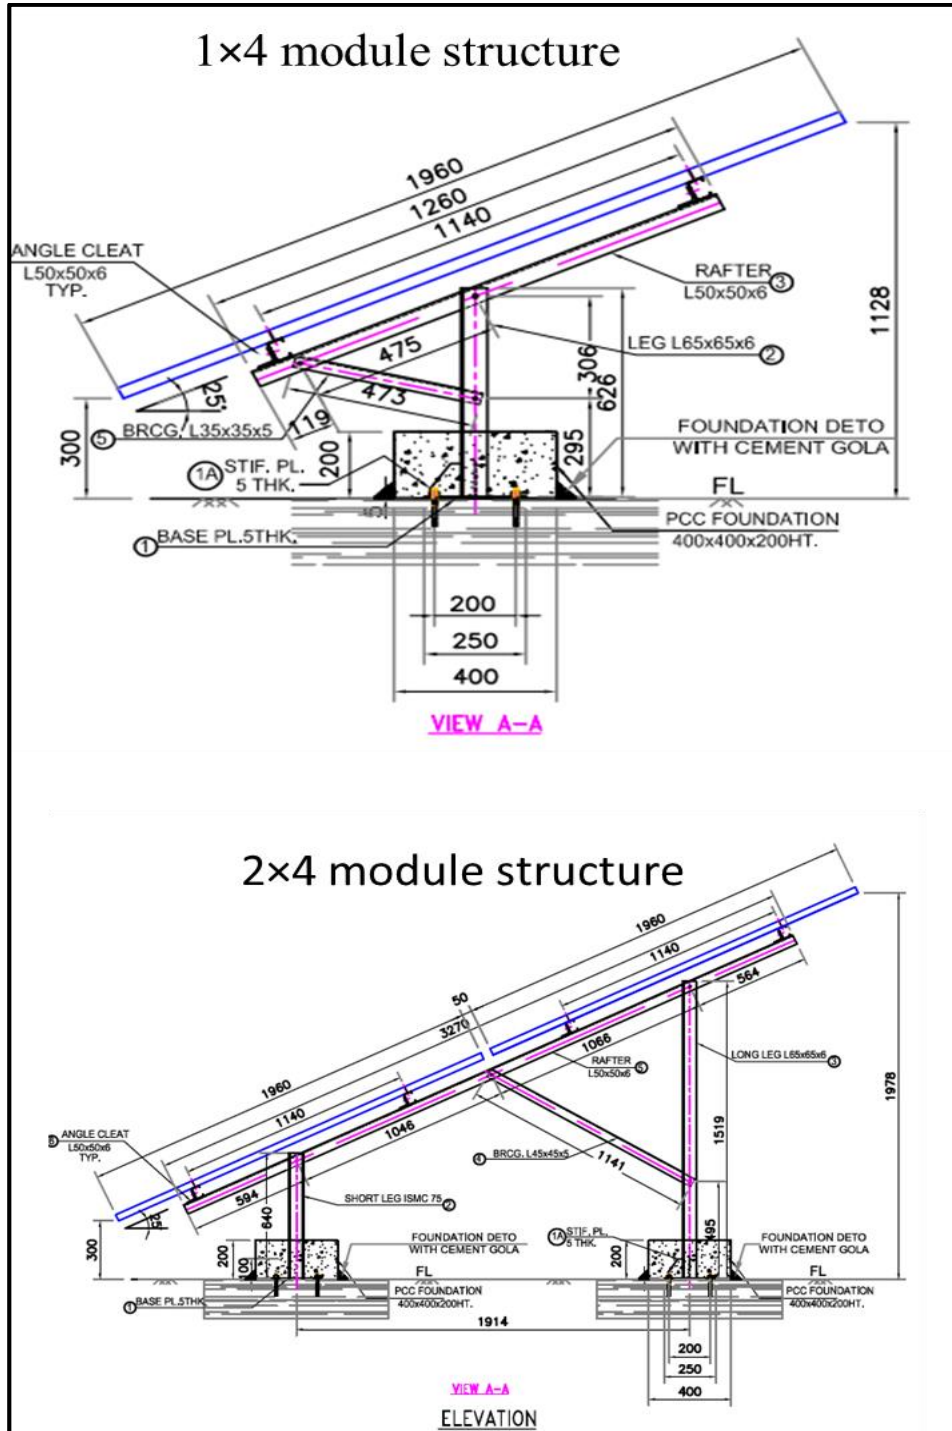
(a) and (b): Section drawing of module mounting structure
